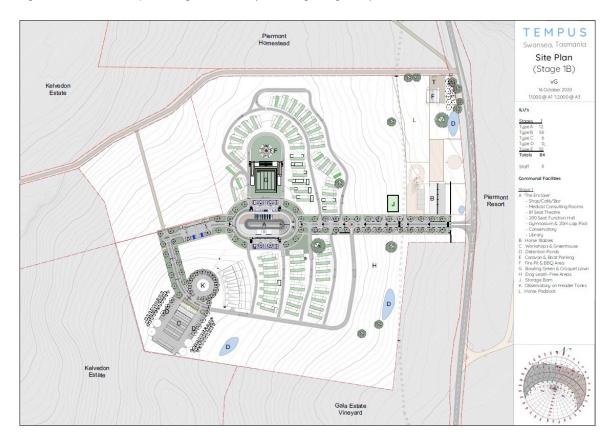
Tempus Stage 1B Plan (including Stage 1A)
